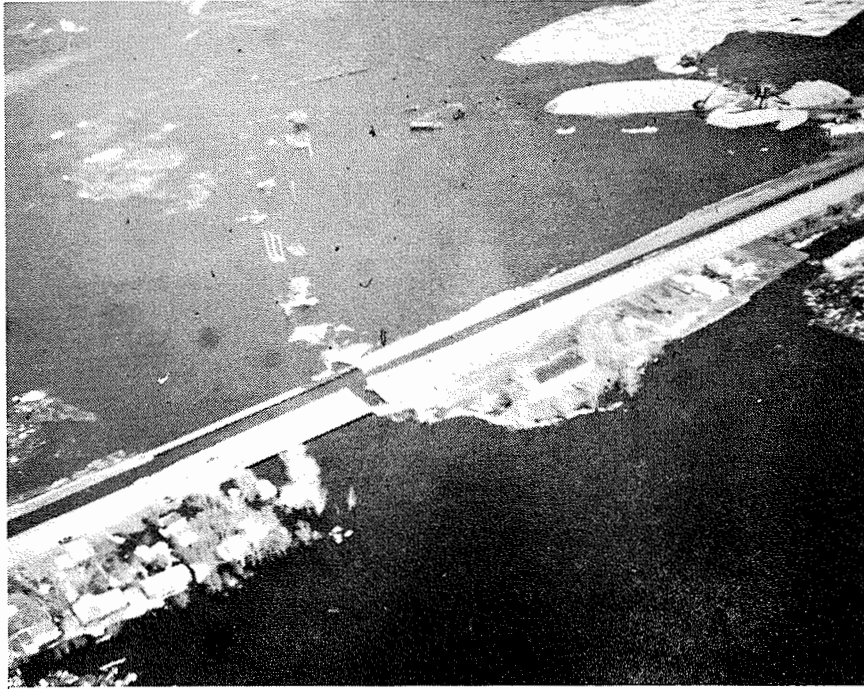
Aerial photo showing Highway 20 and erosion on the east side of the bridge (April 10, 1969).
